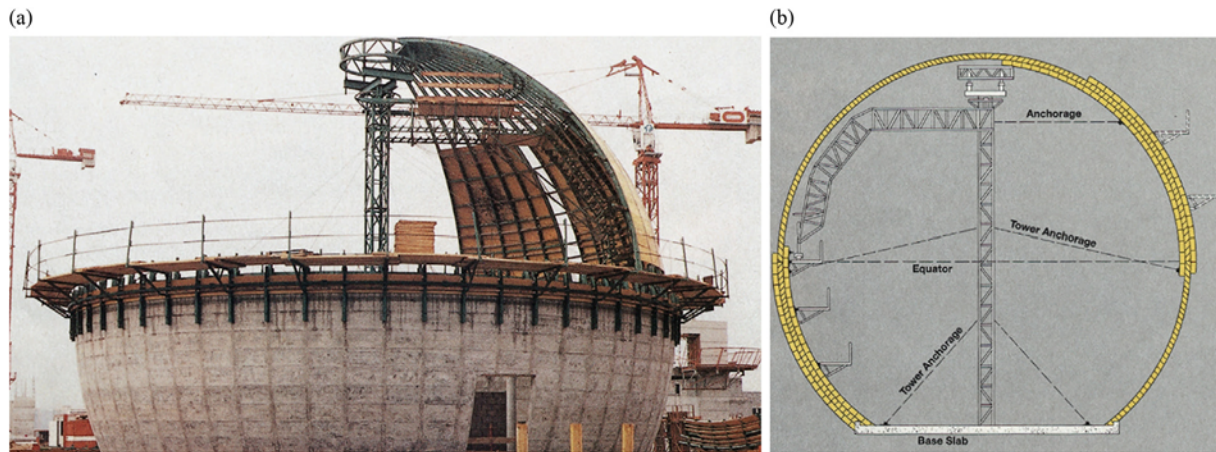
Construction of a concrete sphere house planetarium [34]: (a) placing the interior formwork for the upper half of the sphere above the equator, (b) schematic view of the equipment with a central tower and a rotating framework supporting the access ladder for the workers.
